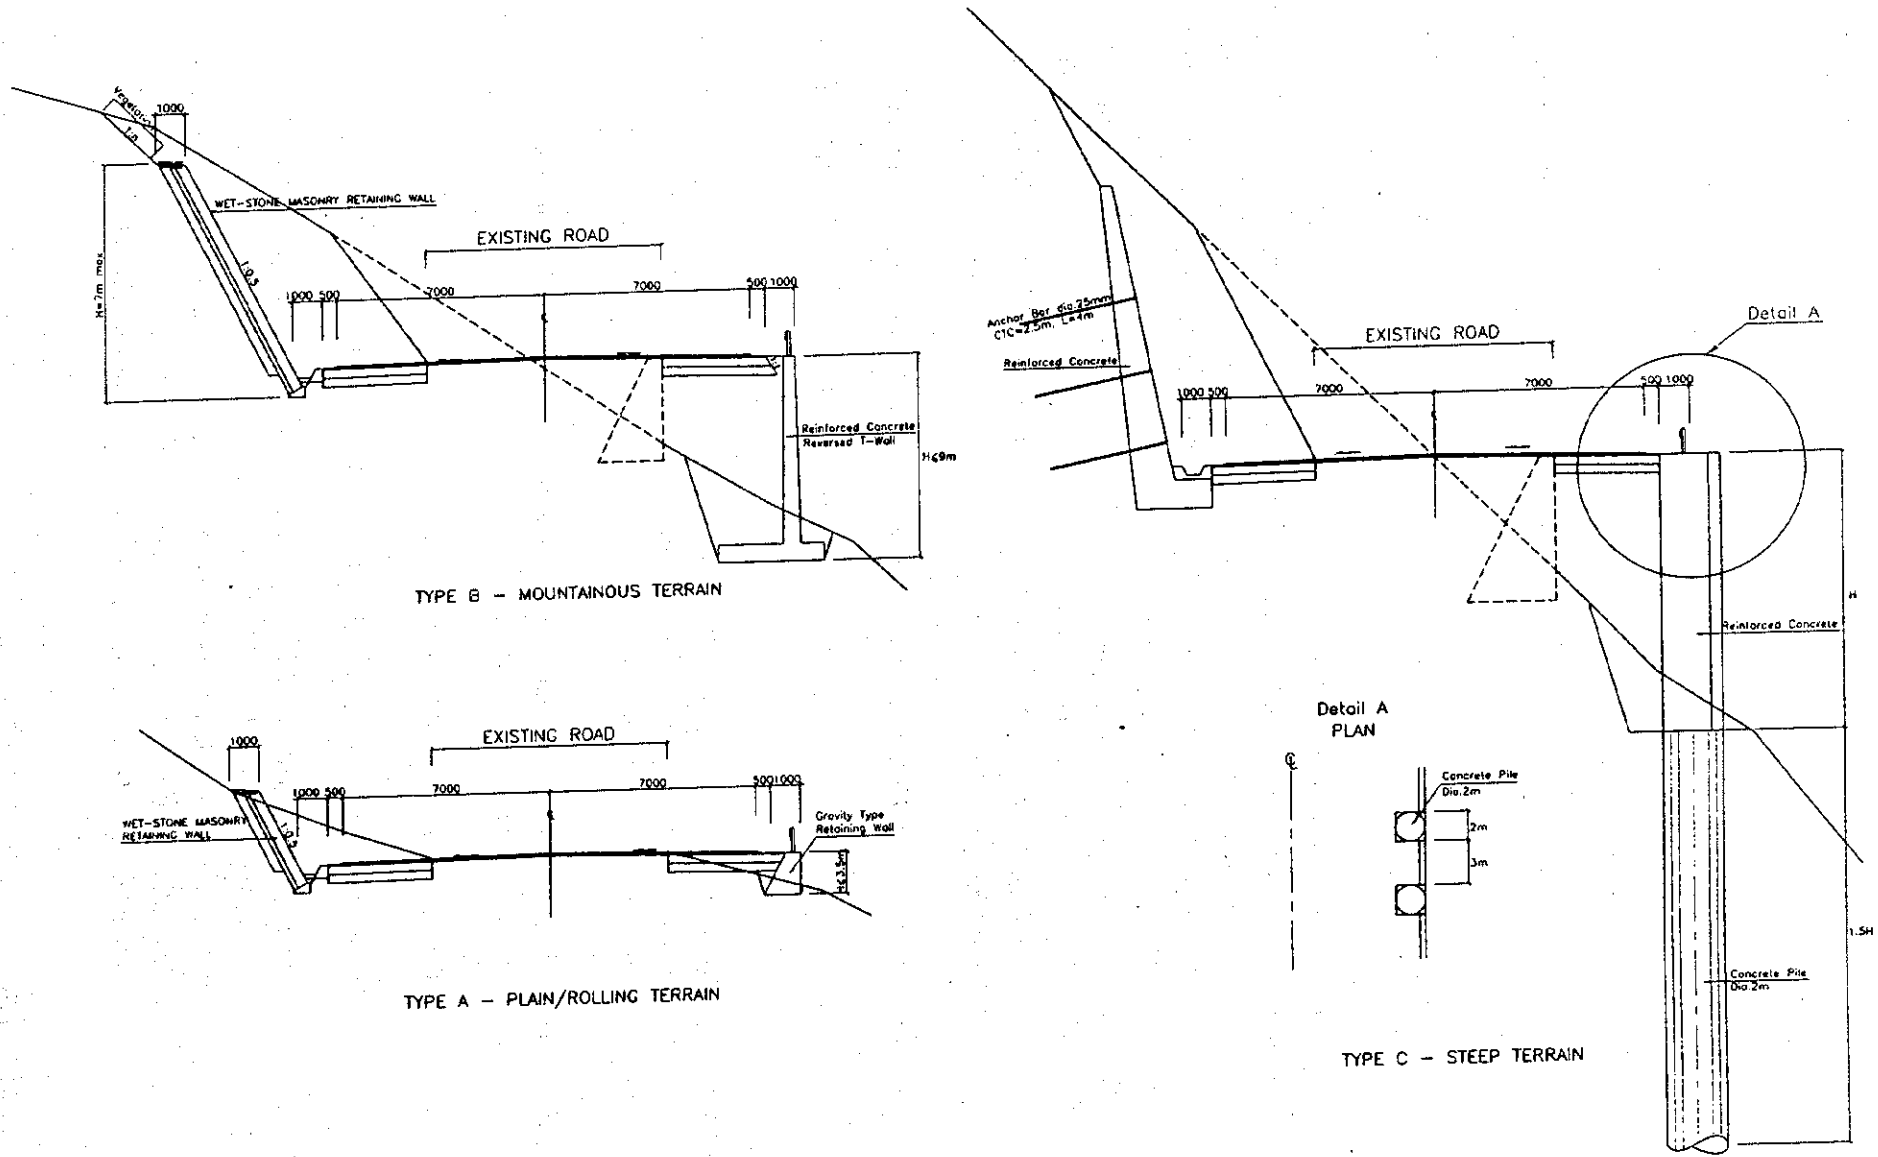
TYPICAL CROSS SECTIONS FOR WIDENING OF EXISTING TRIVUBAN HIGHWAY TO FOUR LANES
